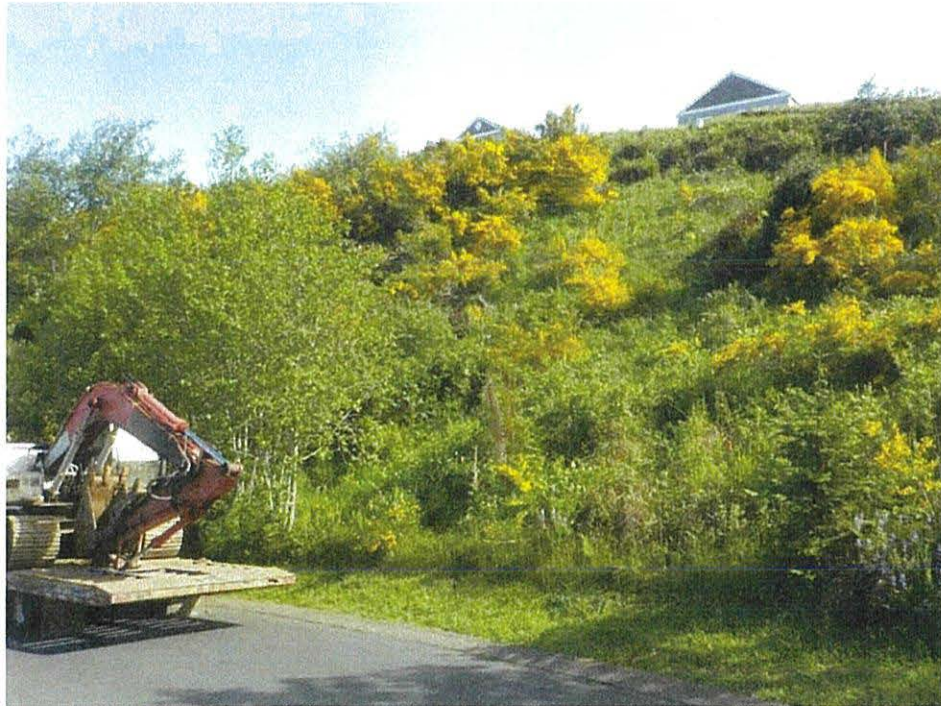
Northwesterly view of the site looking upslope from Tyee Court towards Sahhali Drive (2018).
